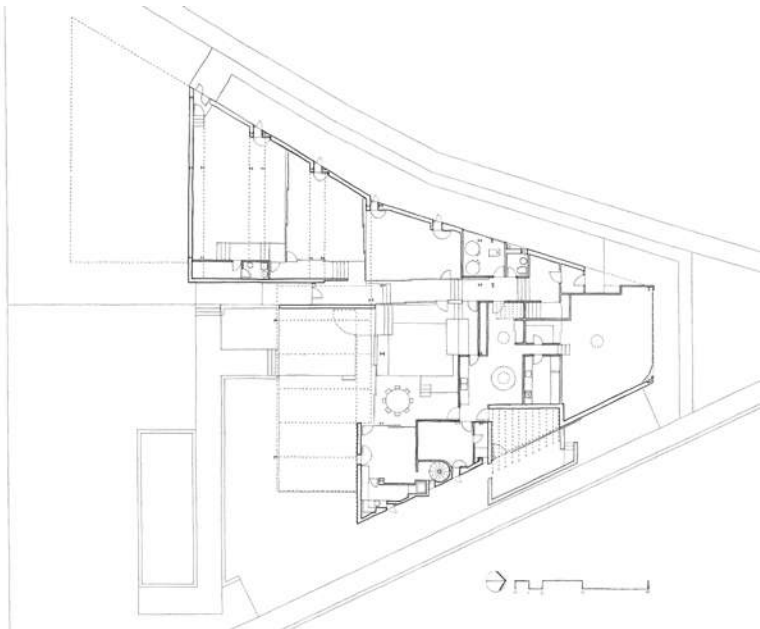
Main floor plan of Corrales House. Drawn by Enrique Delgado Cámara
